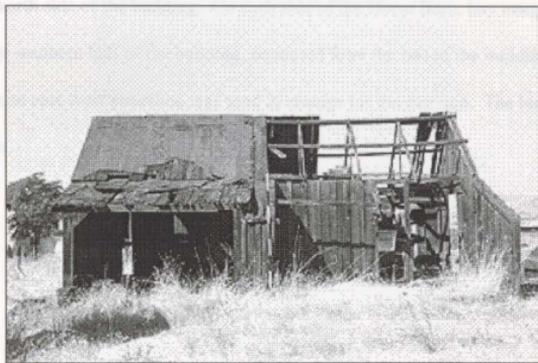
Horse Barn, Detail Showing the Roof with Sheet Metal.
